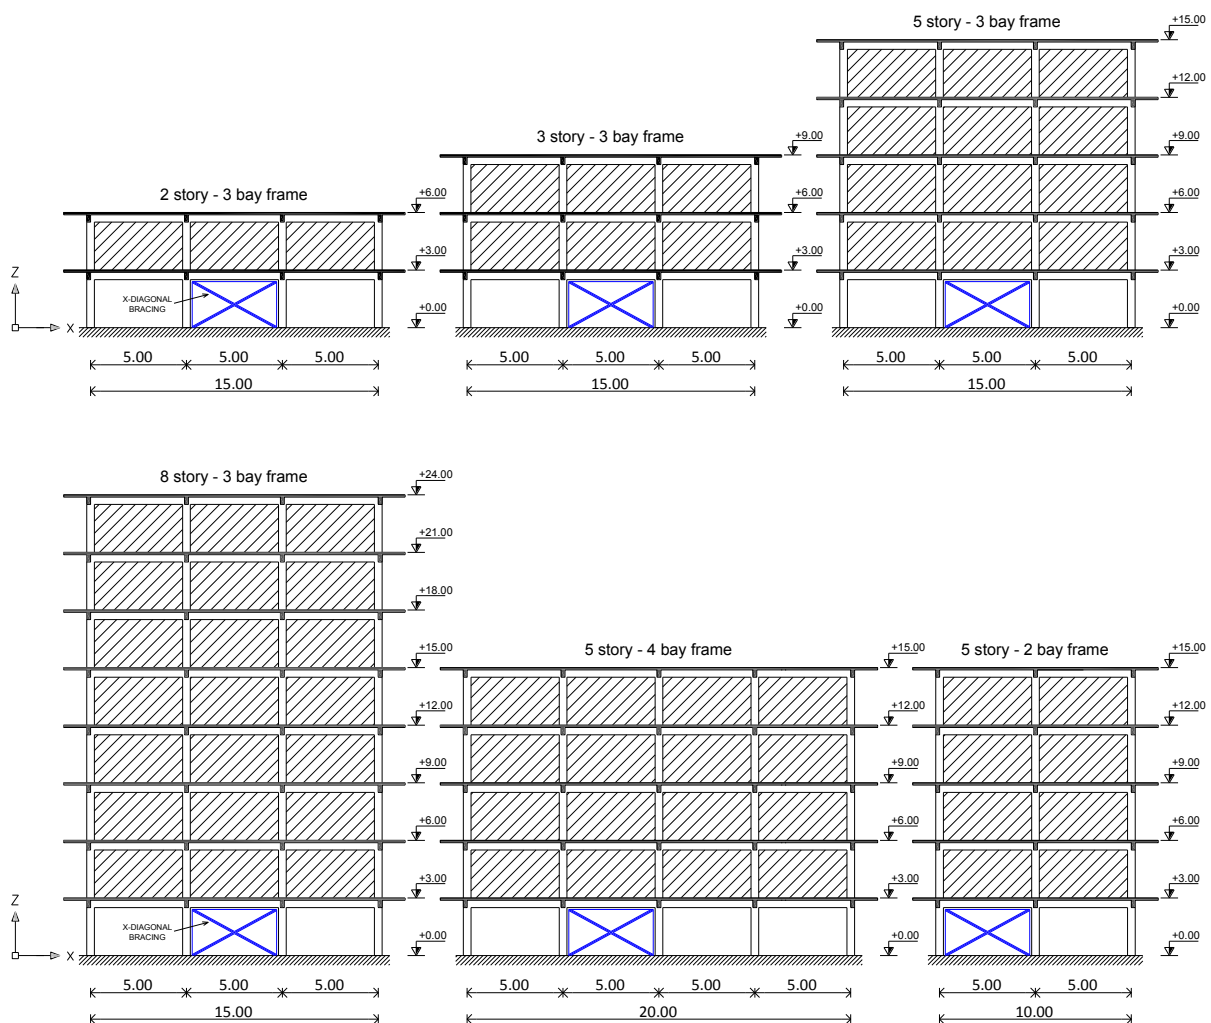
Typical elevations of the plane (2D) frames considered in the analyses.
